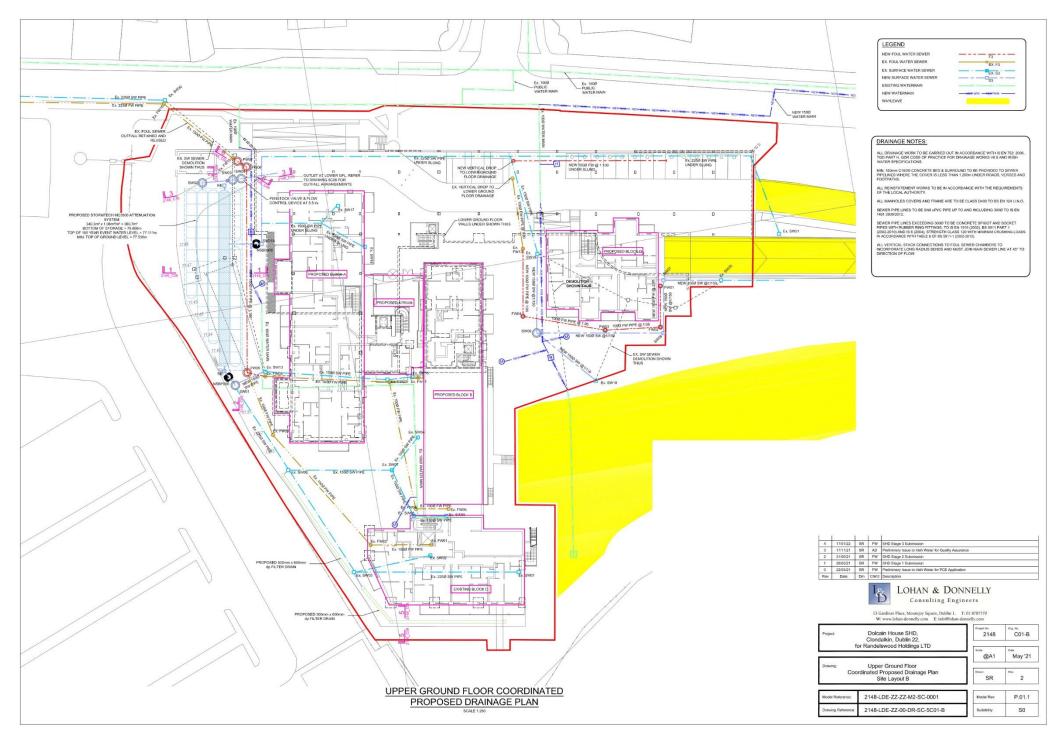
Proposed drainage plan - upper ground floor (co-ordinated) - Option B
